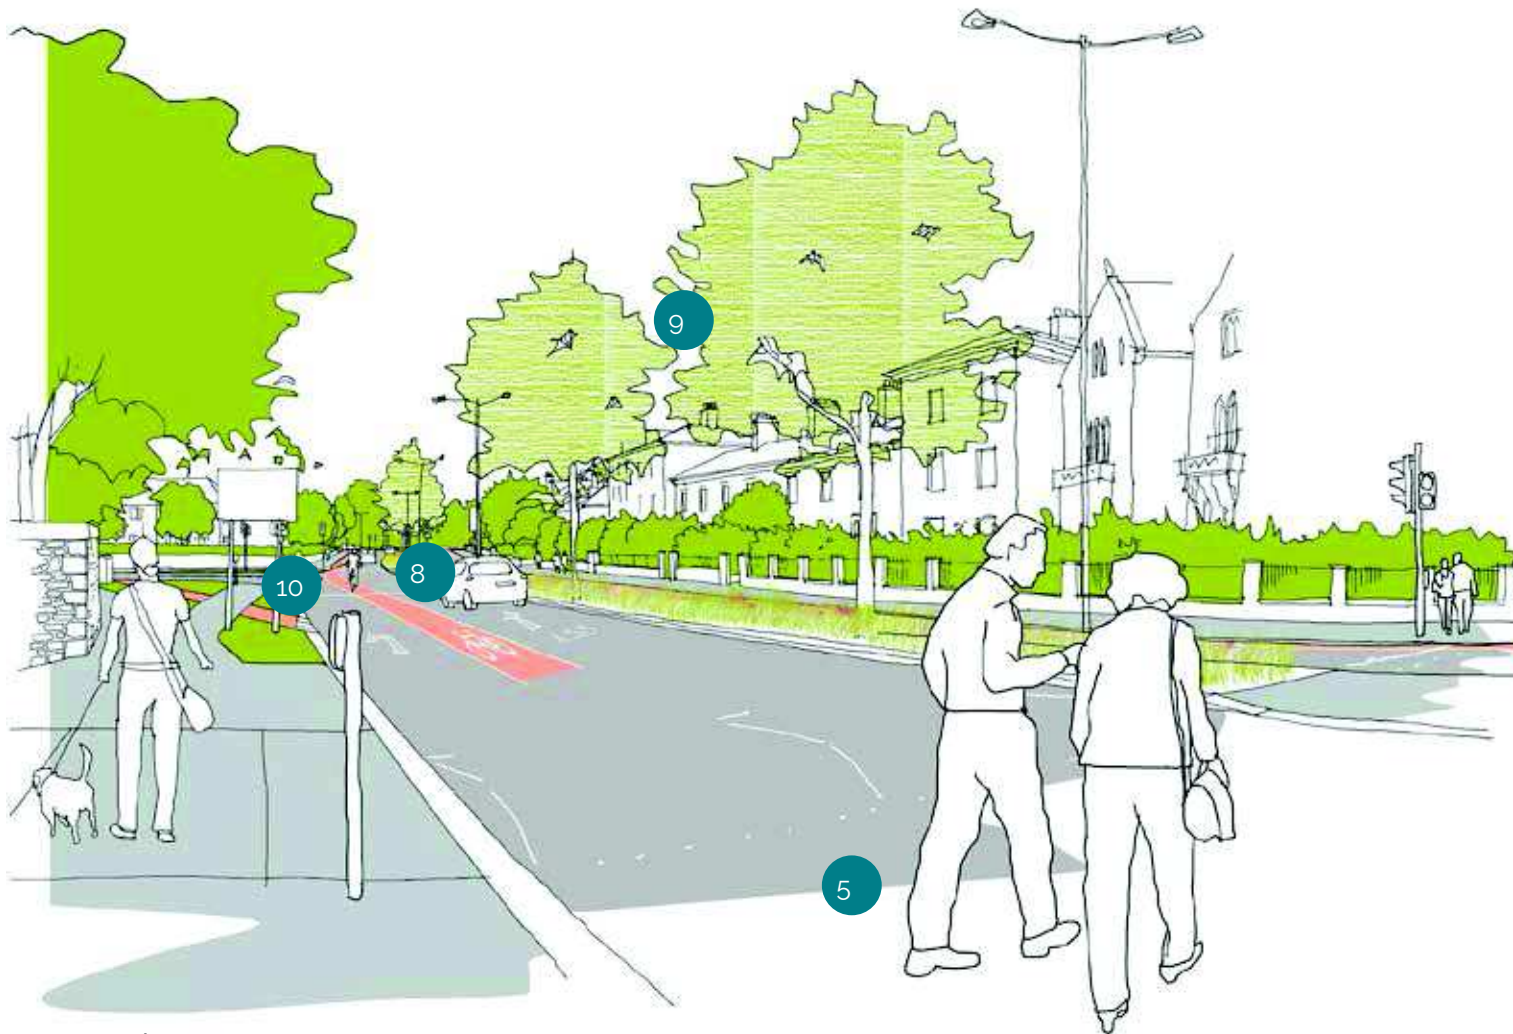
| Illustrative street view of a town centre inner main street with high through traffic level. Good quality direct walking and cycling connections and planting.
